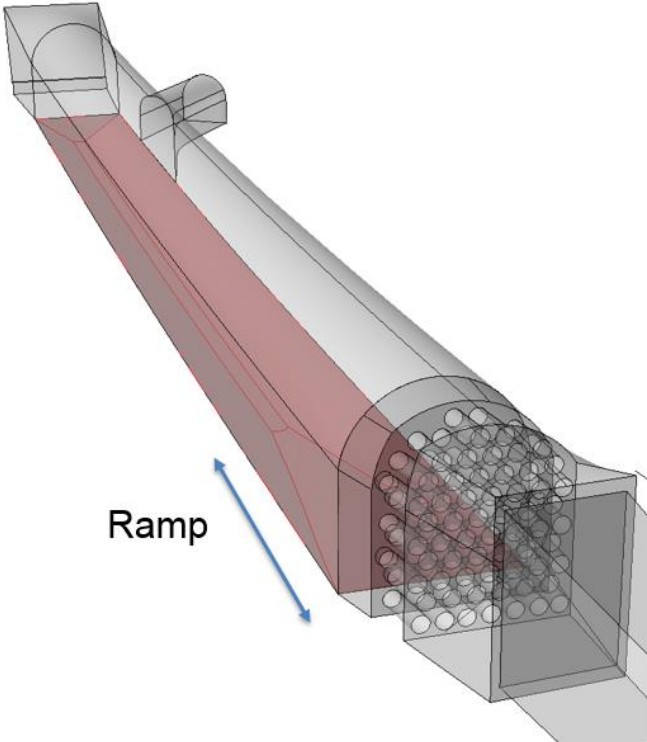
Variant 5 with flow calming pipes and bottom trench for sluicing facility, view of ramp
